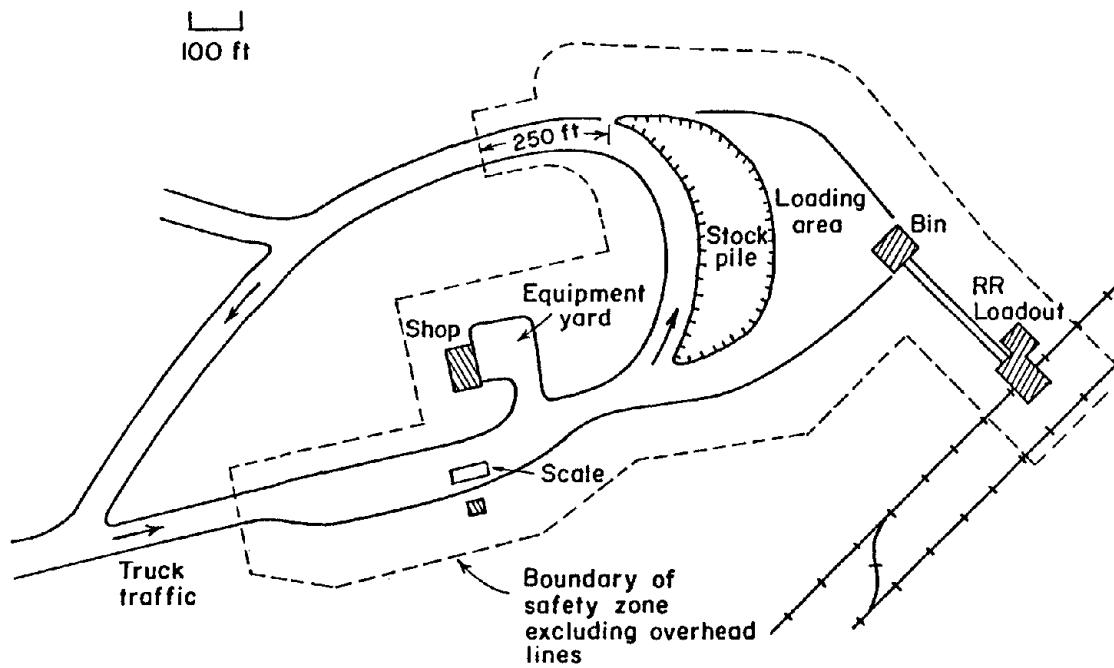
Coal-stockpile/railroad-loadout installation illustrating a recommended zone for exclusion of overhead lines.
